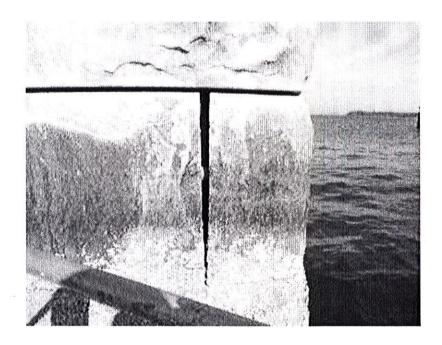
Photo 44 Appendix D Apparent Settlement and Rotation of Southernmost Stone in the Third Course of Pier 4
